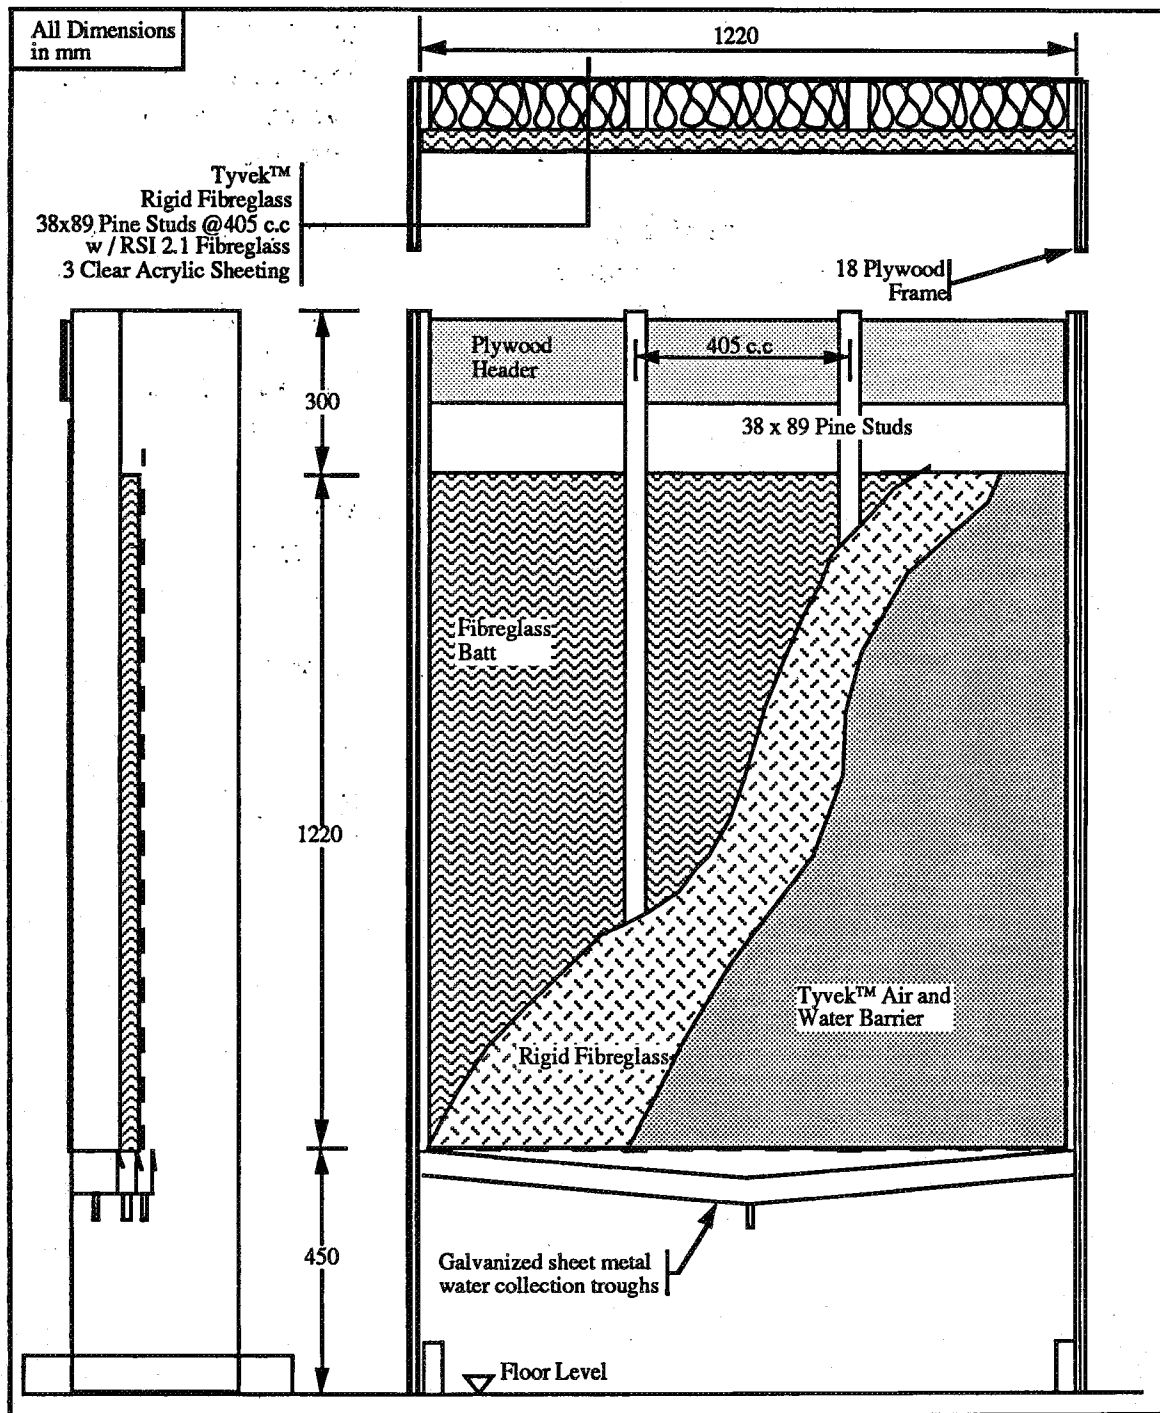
Datum Panel Mockup Elevation and Sections
